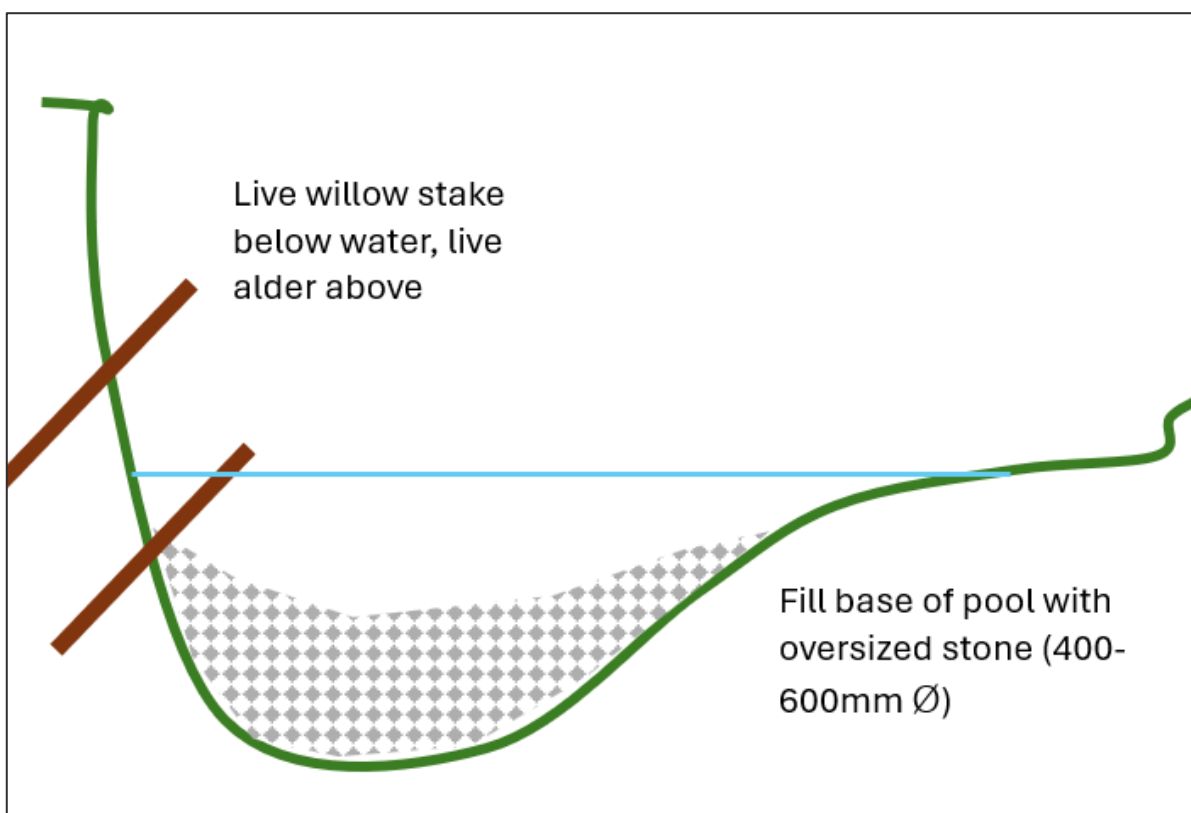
Detailed design drawing cross section of site 5 bank restoration.
